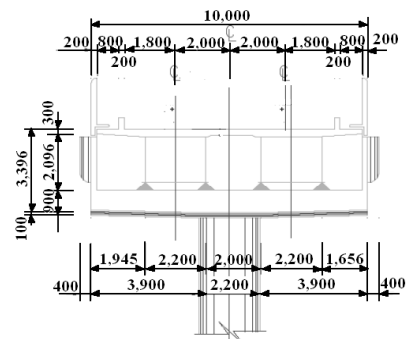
Structural configuration of the elevated bridge on #2 region (unit : mm)
